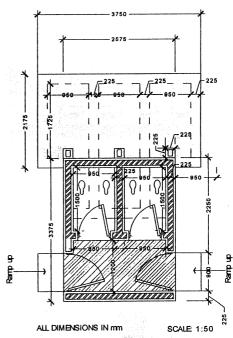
Floor Plan of the 2-compartment VIP Latrine
